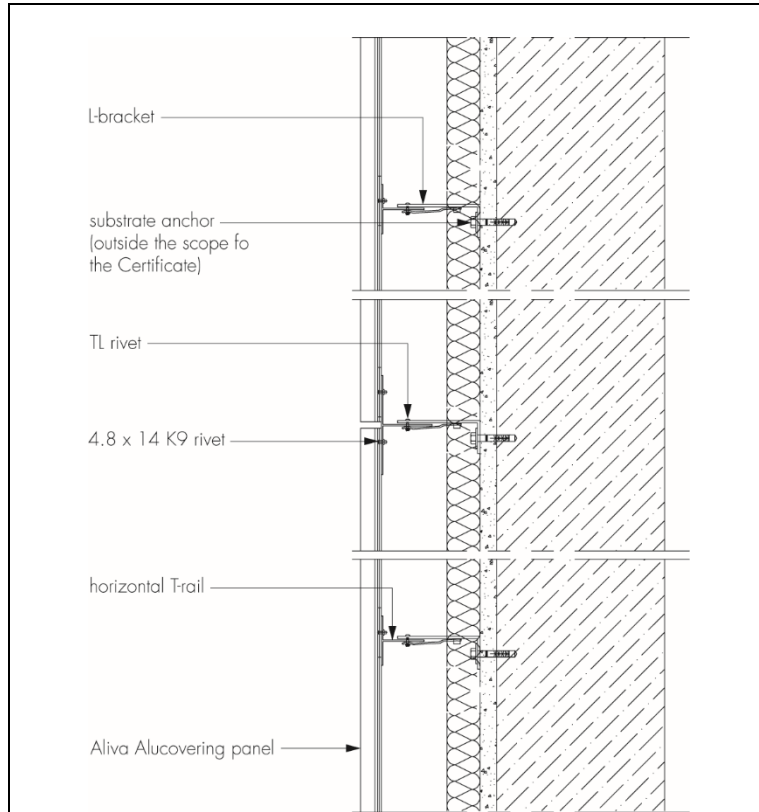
Aliva Alucovering Rainscreen Cladding System, box section connection, cross section of vertical panel installation
